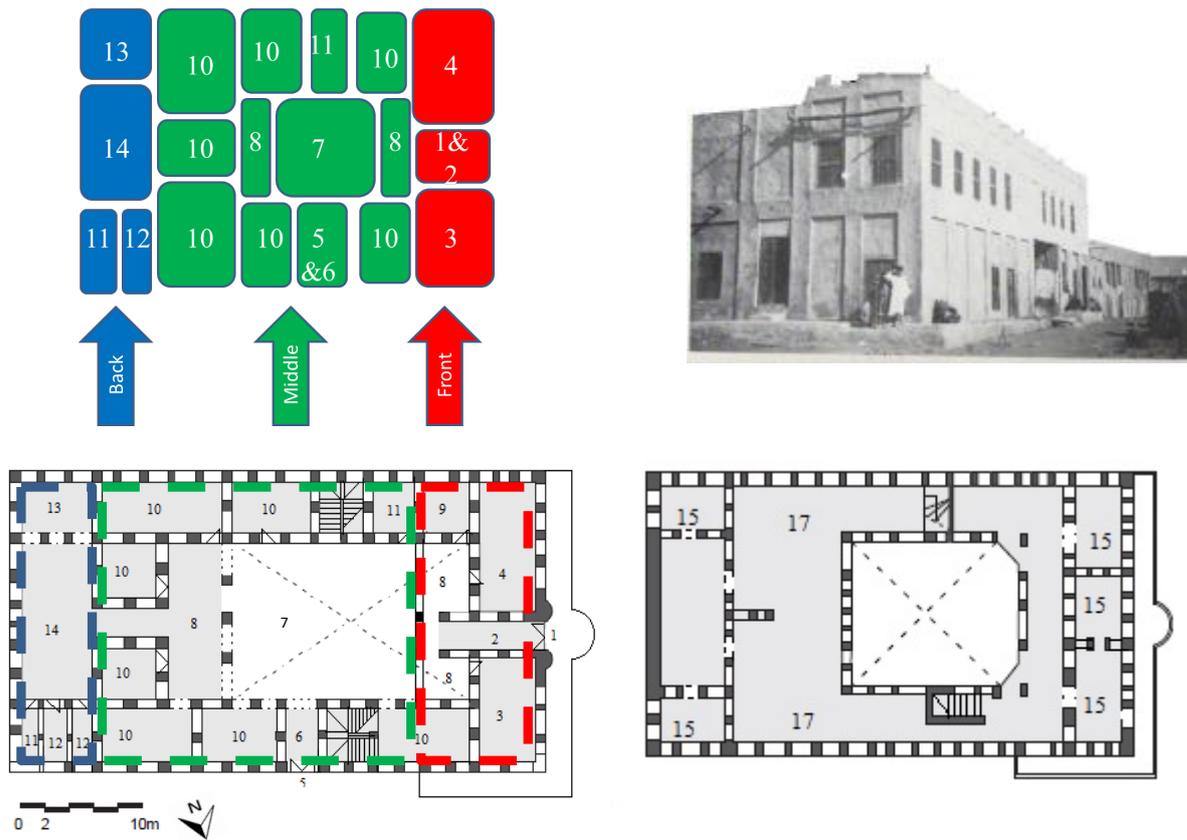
A very common traditional house design in the Dammam metropolitan area.
